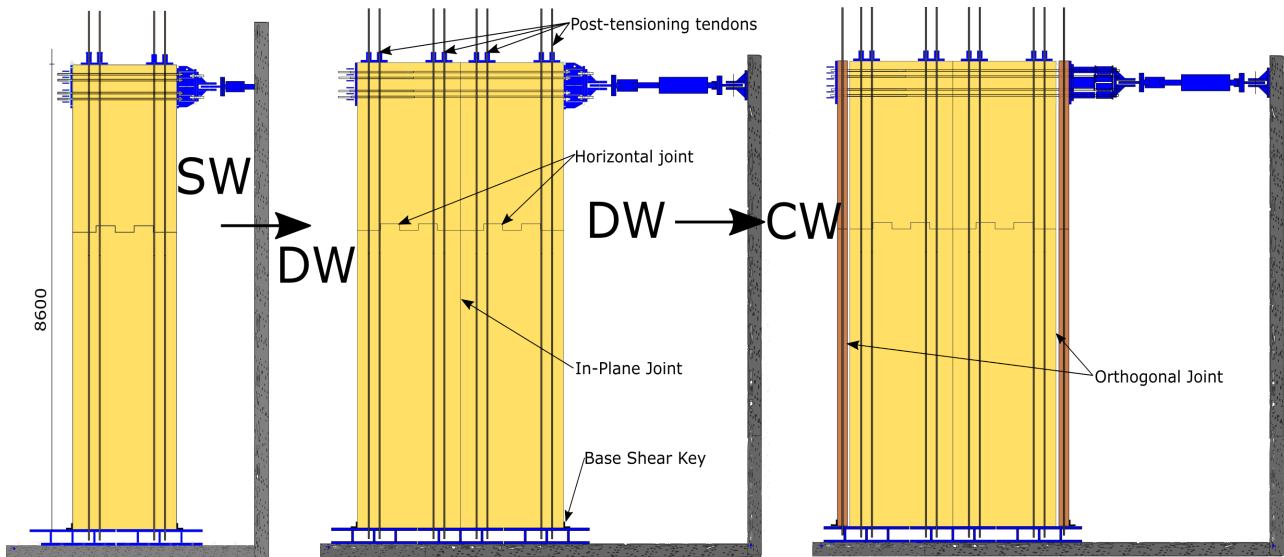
Wall Testing Plan Programme adopted from Brown et al. (2020b)
